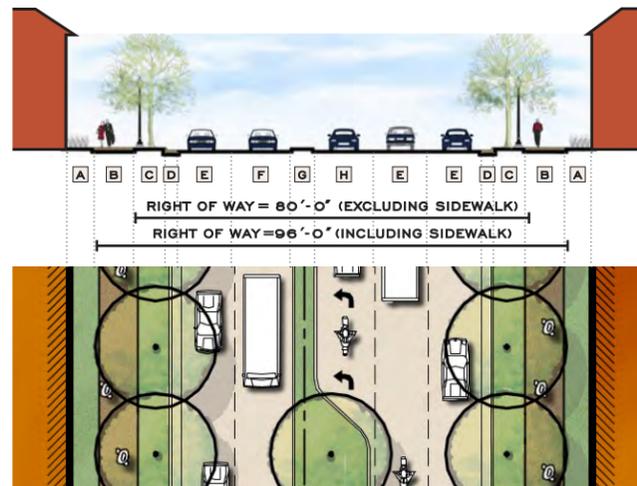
Falmouth Village Section & Plan – Warrenton Road (US-17)
